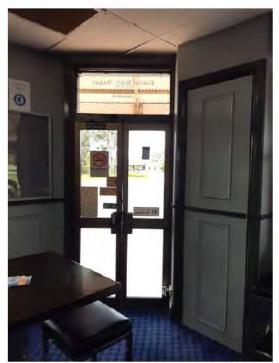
| Corner splay door to be replaced with eraappropriate timber framed glazed doors.
